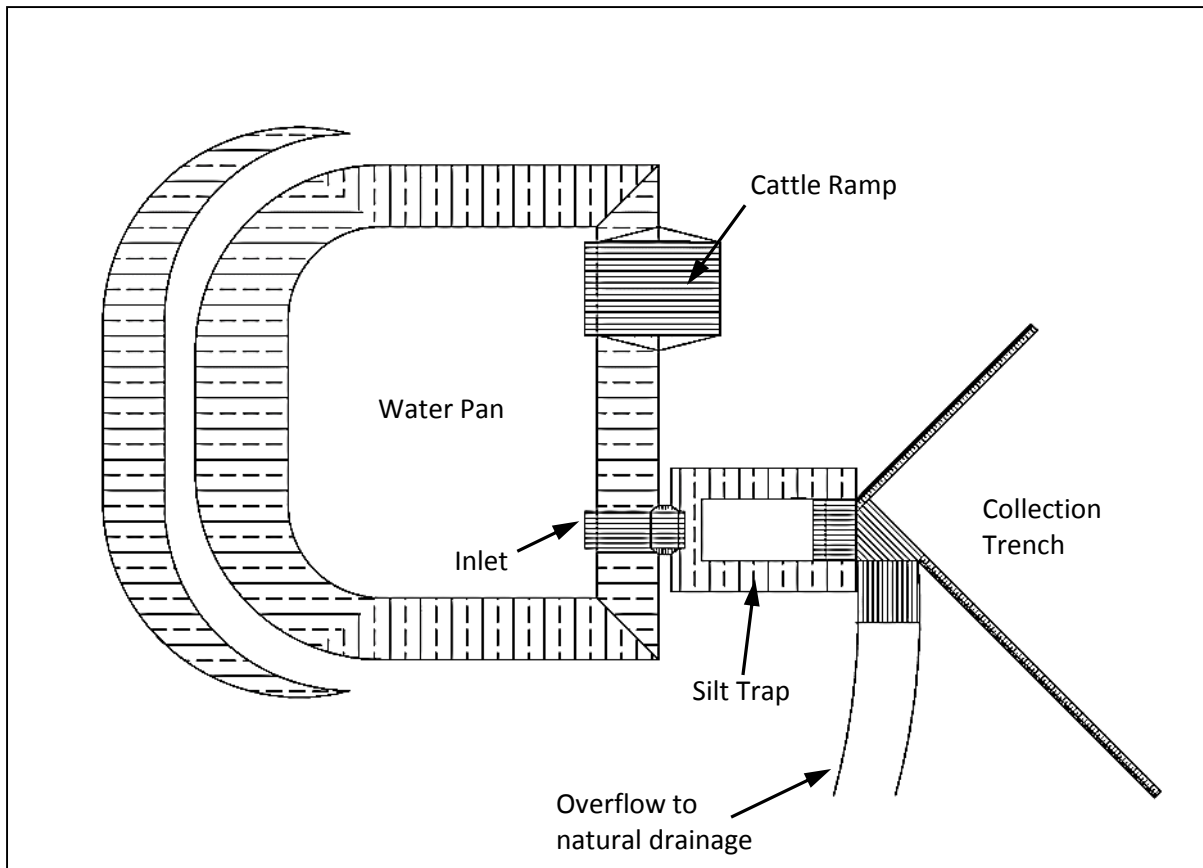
Typical Site Layout showing Silt Trap and Overflow
